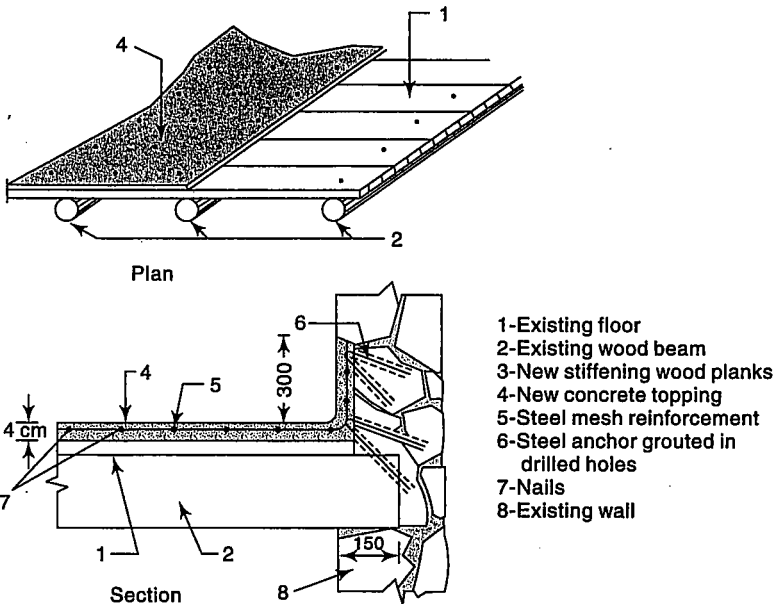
Stiffening of wooden floor using reinforced concrete slab and a connection to the wall
